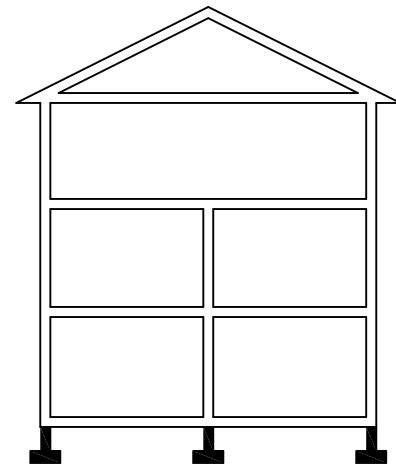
ROOF, CEILING AND THREE CENTER-BEARING FLOORS
